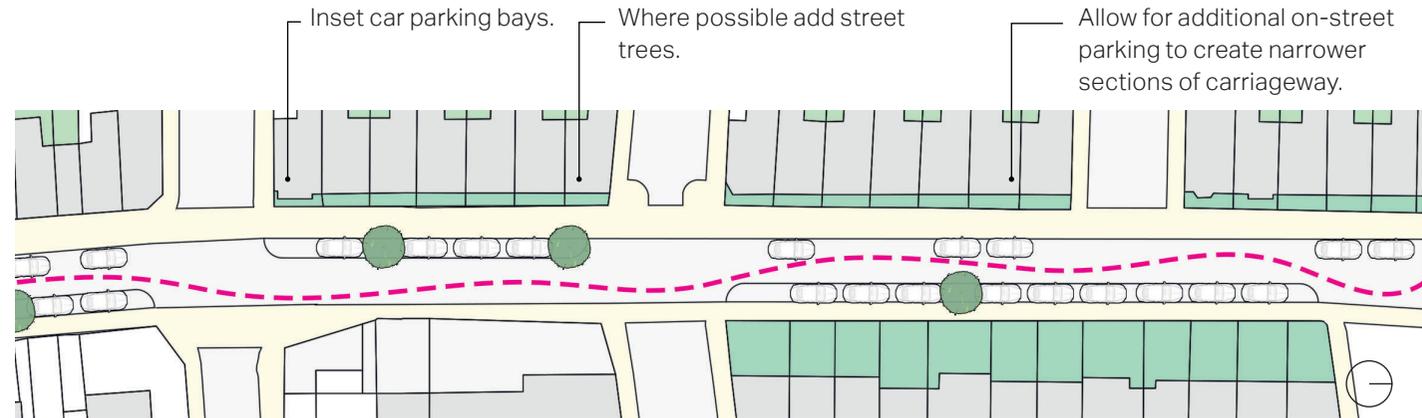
Plan illustrating an example on how to improve Semilong Road and how vehicles can weave through the parked cars.
